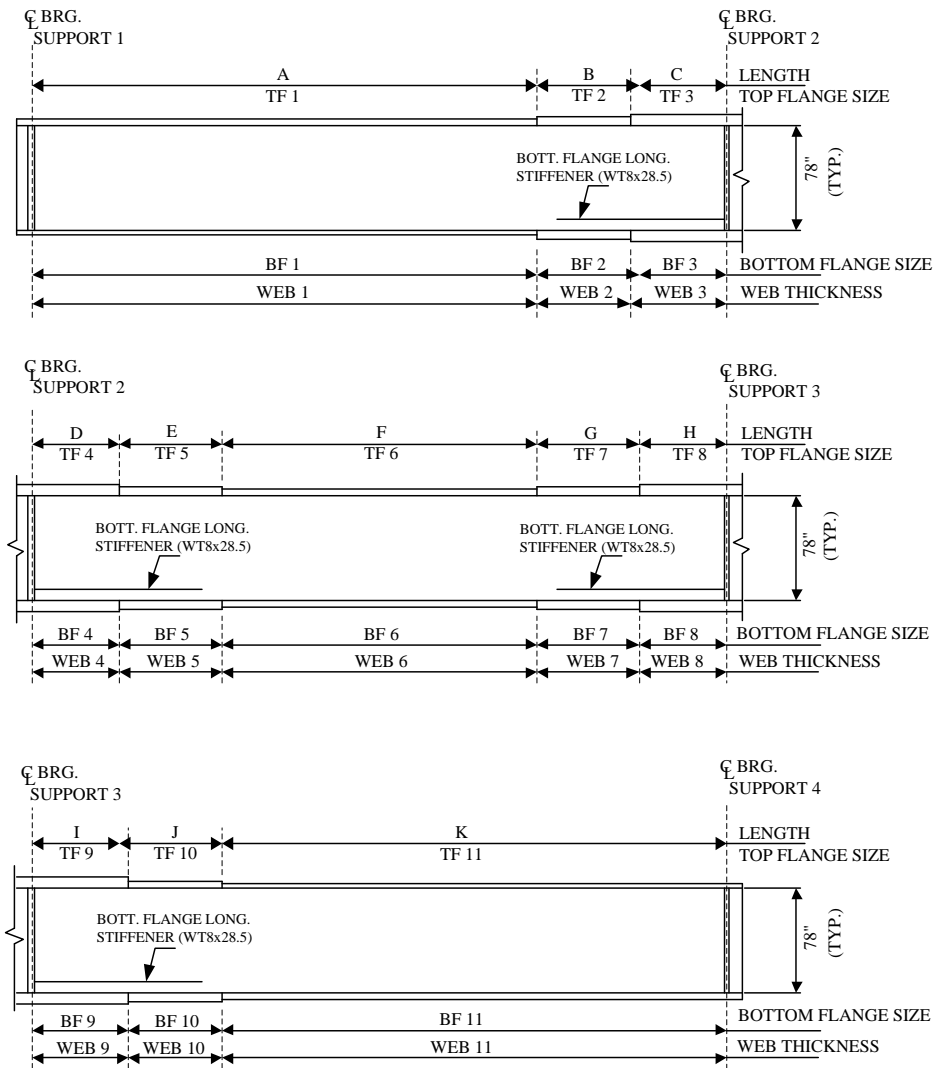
XTCCR8, framing plan and general dimensions.
